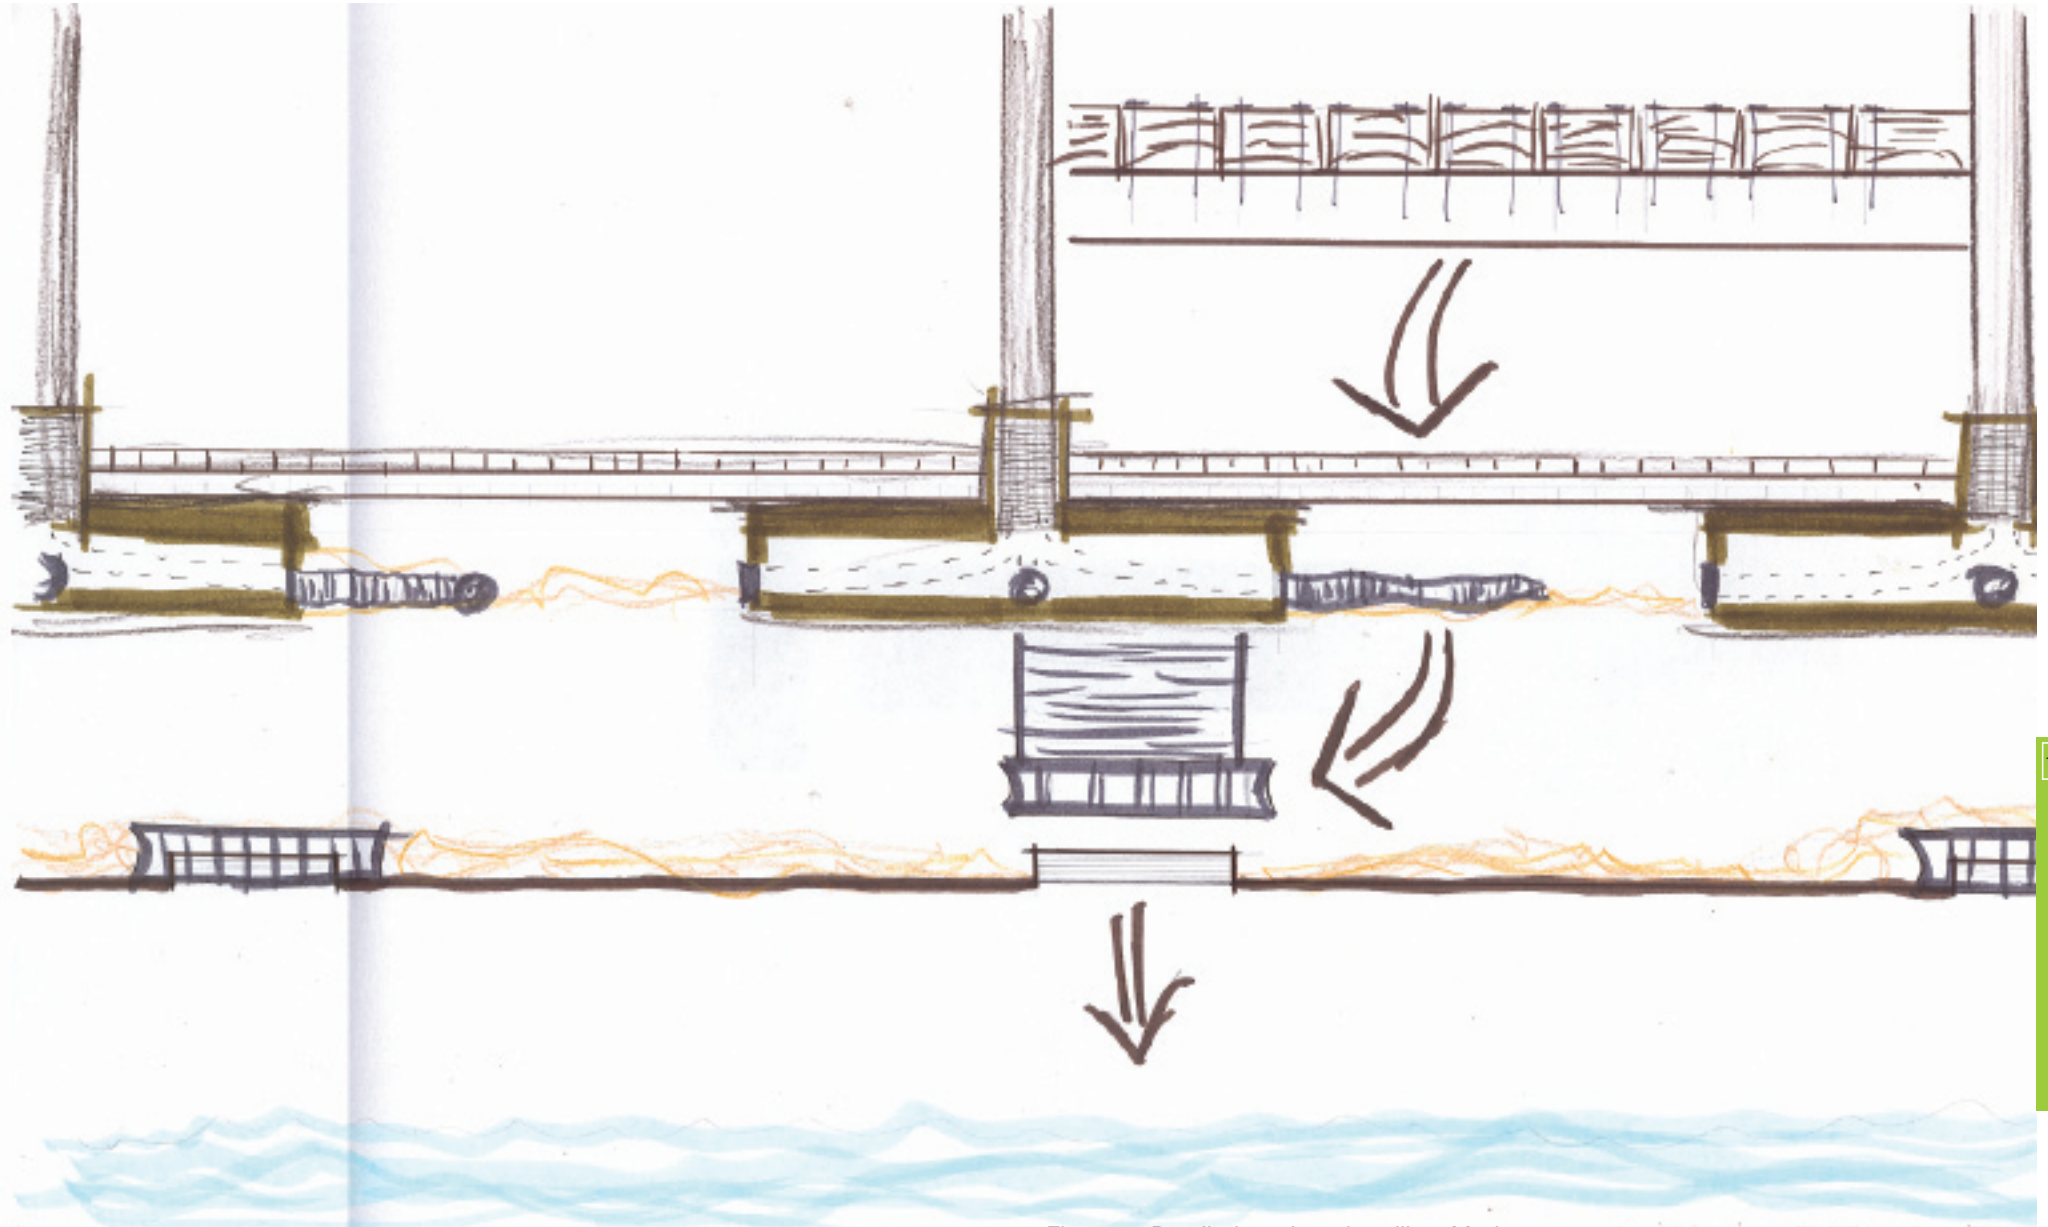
Detailed section of pavilion. Modular flooring units rest on plastic pedestals filled with sand. The trumpet umbrellas collect water through acrylic tubes that run through the pedestal, into the flexible cistern pipes, and is stored in the plastic cistern below. (source: S. Ridgely)
